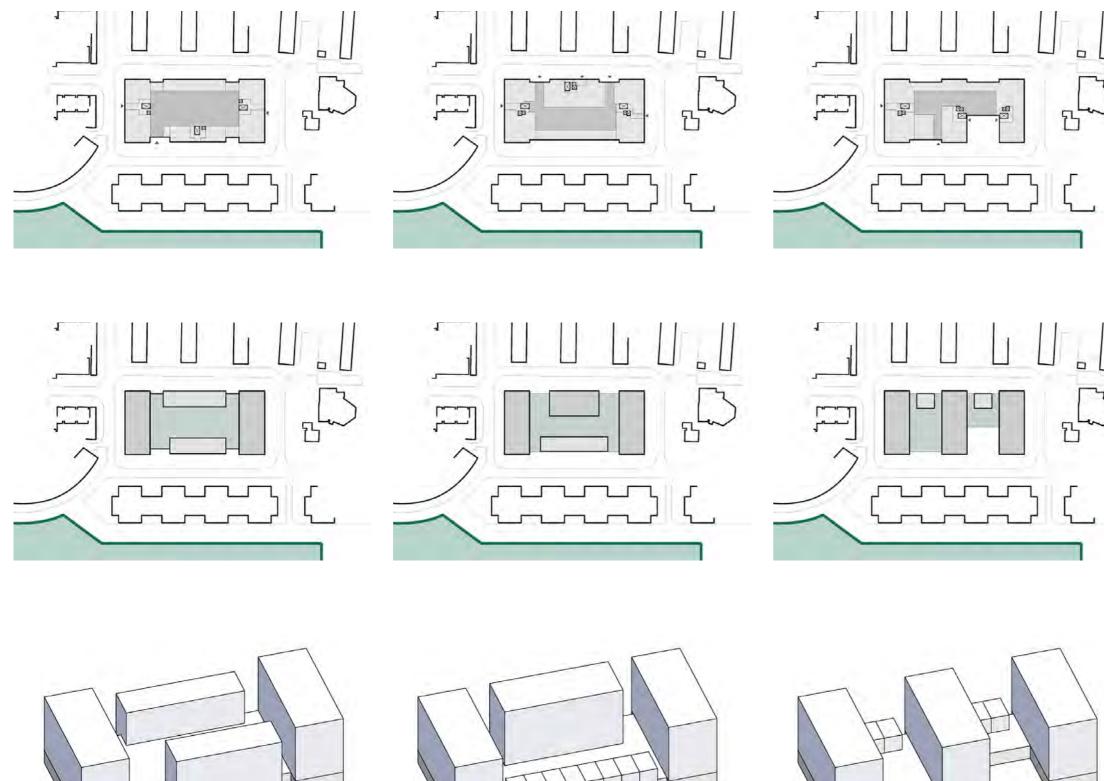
Option A: Ground floor plan, roof plan and axonometric view
